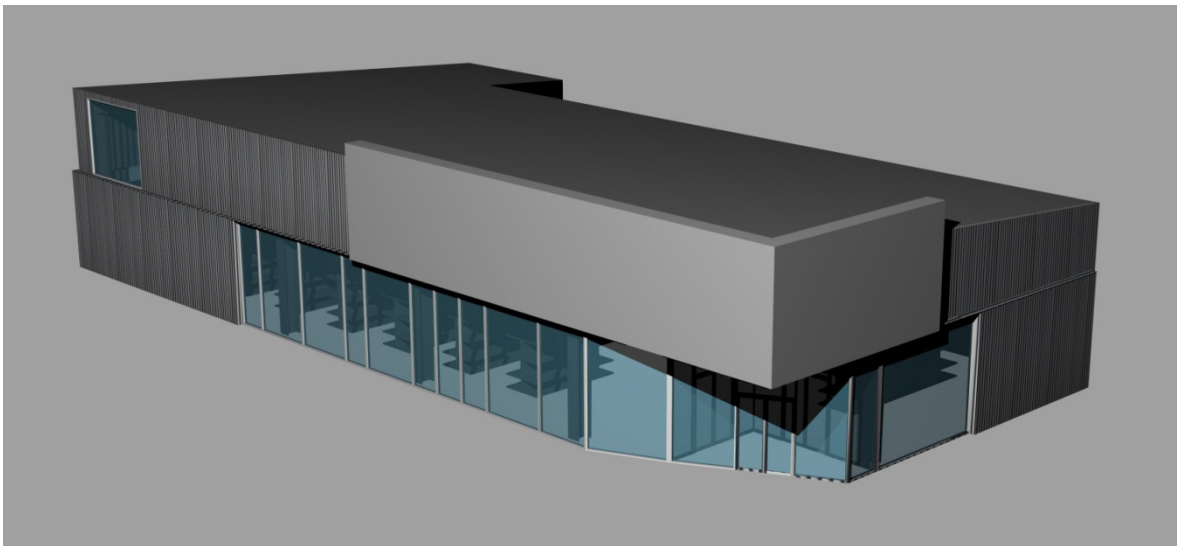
Case Study #4 – Predominately Steel Single-Storey Retail Building
